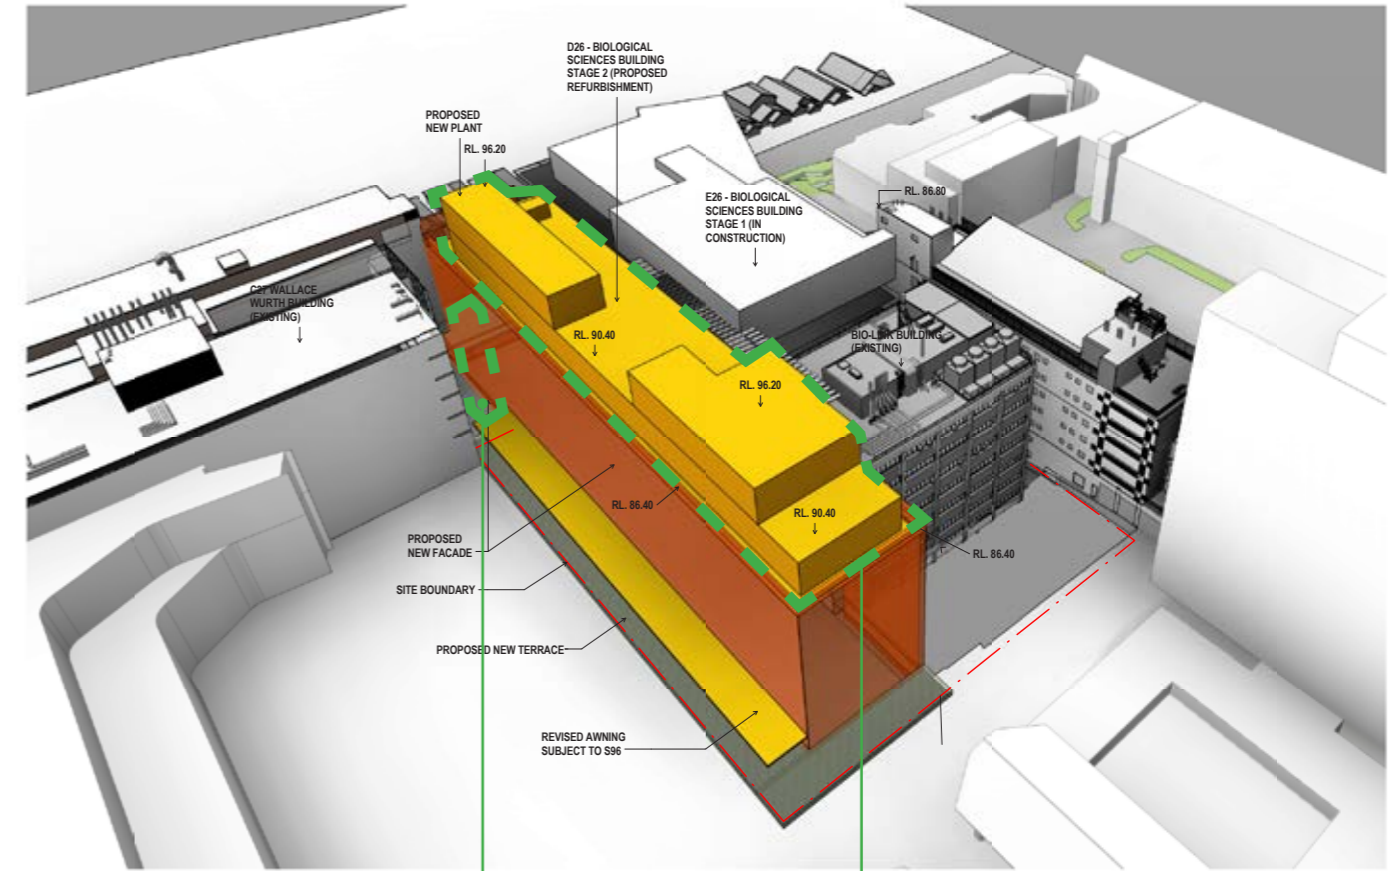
Proposed Amended Building Form (Aerial view from northwest)
